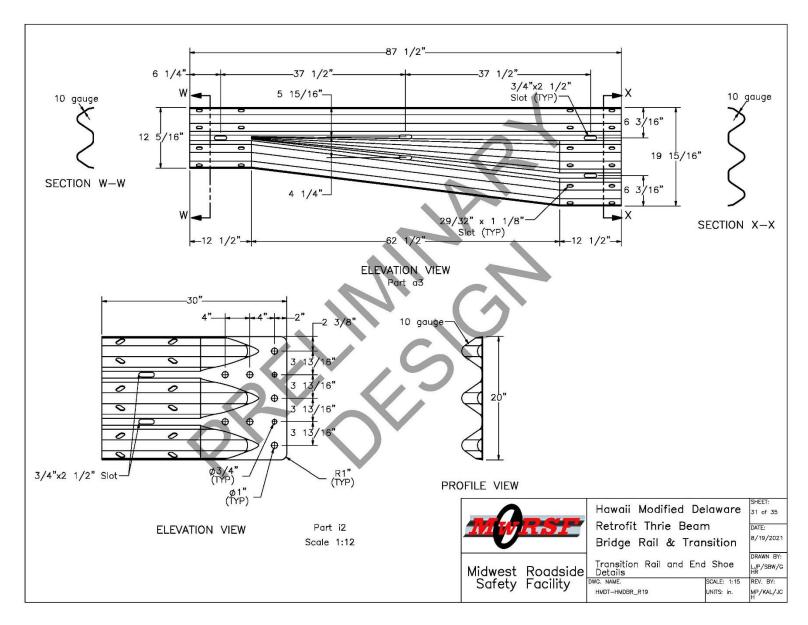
Transition Rail and End Shoe Details, Test No. HMDT-1
